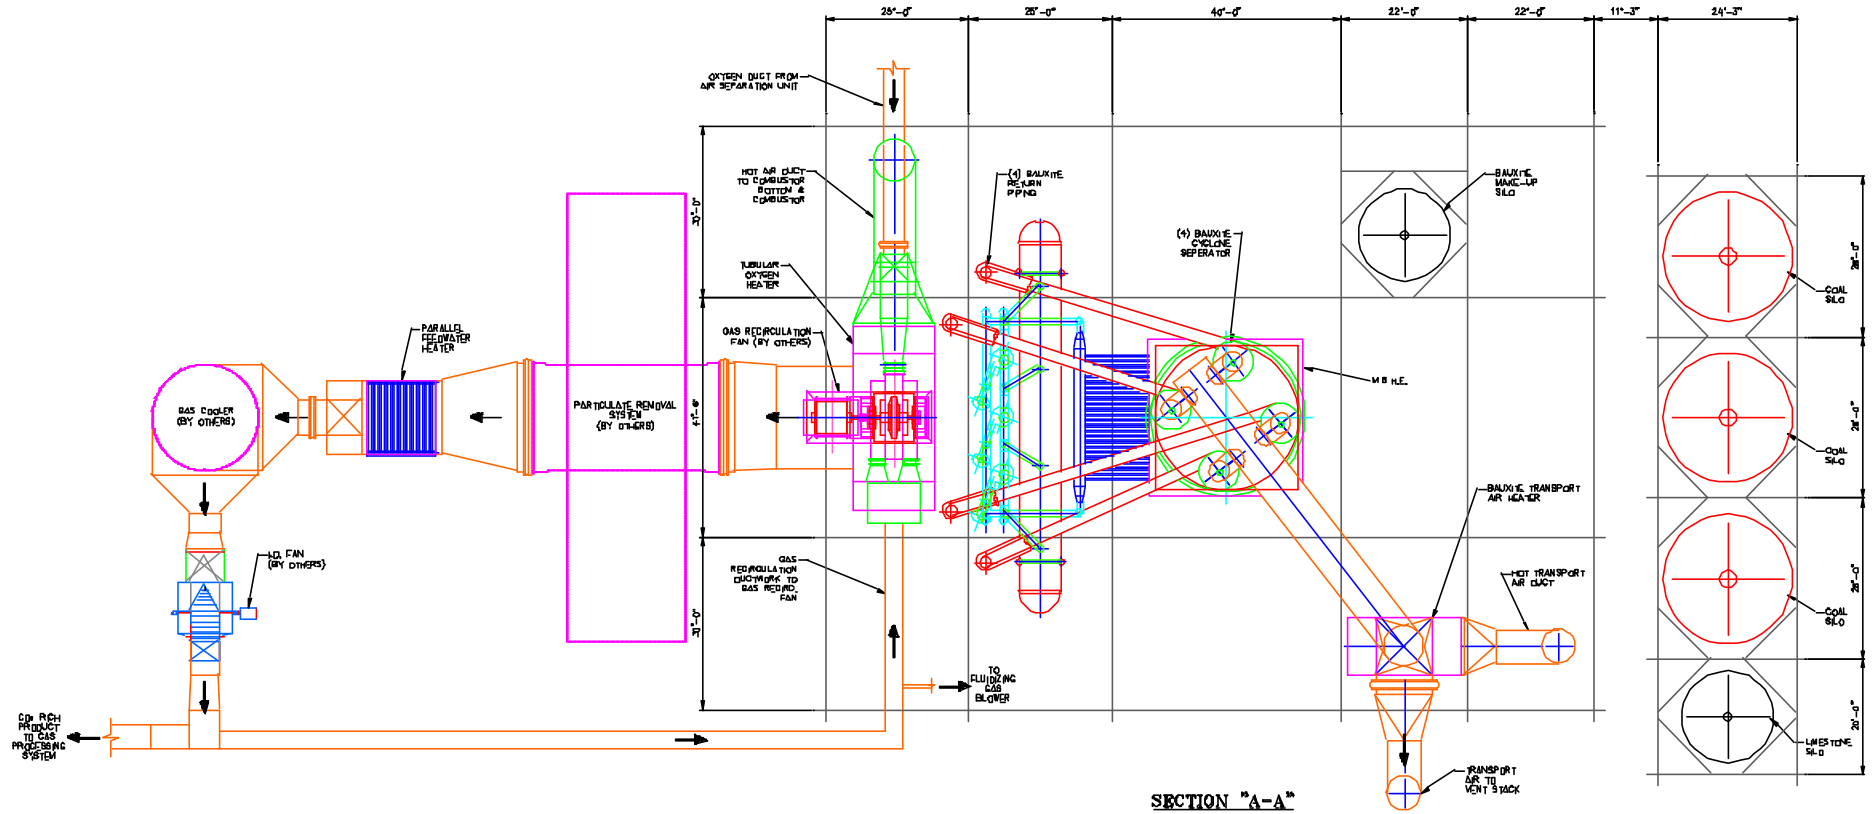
3: Case-4 Boiler Island General Arrangement Drawing – Plan View
